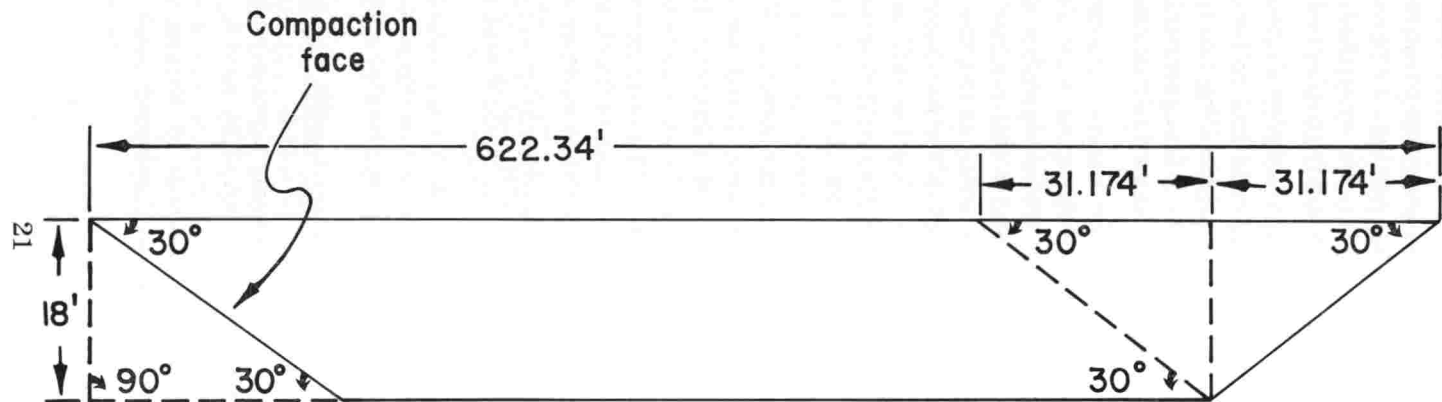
Cross-section of landfill trench with a trapezoidal shape.
